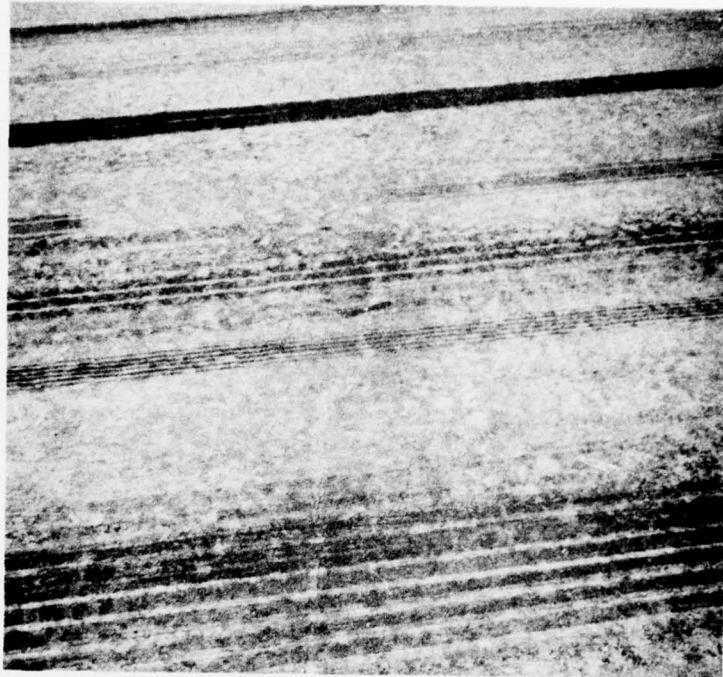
Transverse crack in reinforced PCC slab of NW-SE runway
